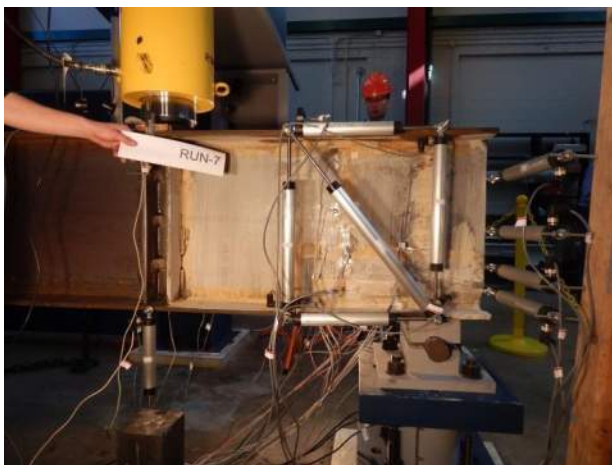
Damaged Girder Left: +0.25 in
